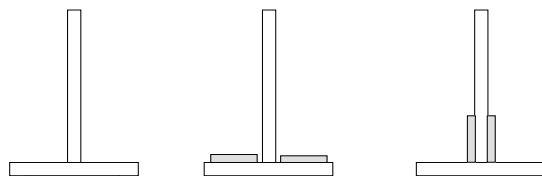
Strengthening the bottom flange of an I-girder using welded steel plates [20].
